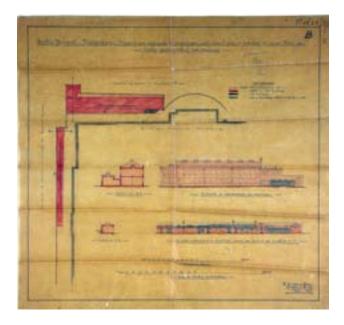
Proposed new workshops for bookbinders [elevation and section in the centre, plan above], and reconstruction of workshops for various trades etc. [elevation and section below, plan to the left]. Sketch shewing [sic] sites of new buildings, December 1897. Copyright TNA (WORK 17/4/3, plan B)
